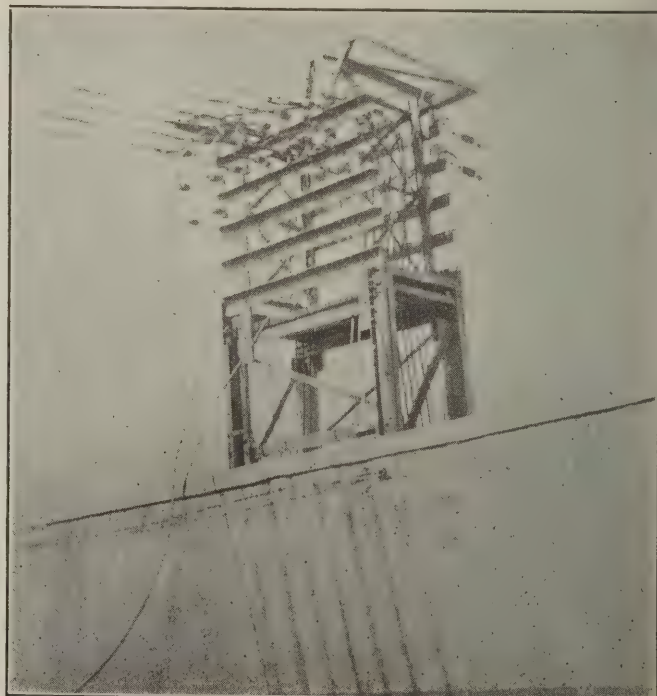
Showing Partly Completed Cabling Running South on Riser Tower "A"
